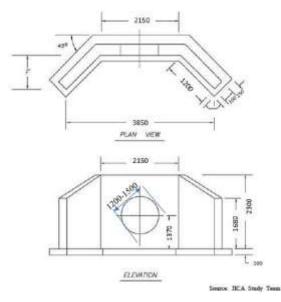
Planned Culvert Design Source: JICA study team, 2018
